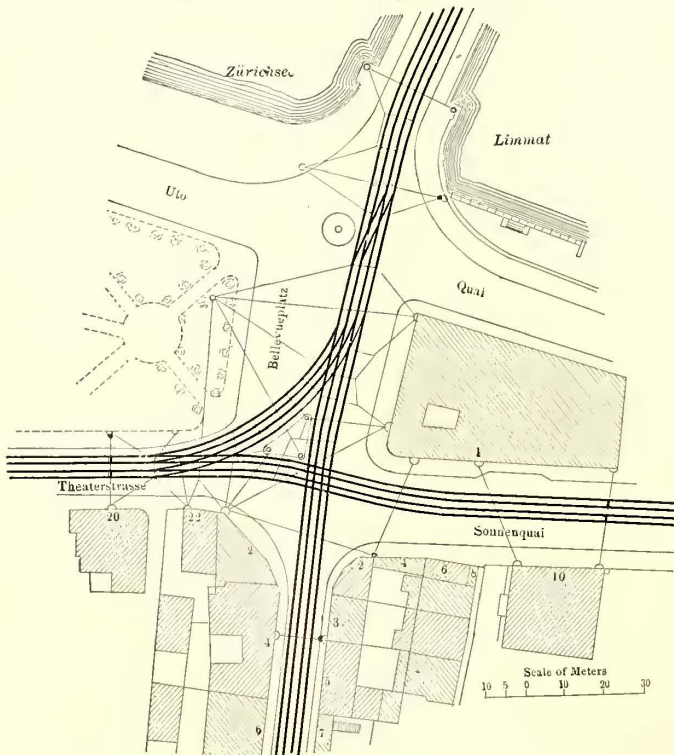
SPECIAL WORK AND OVERHEAD WIRING AT BELLEVUEPLATZ
